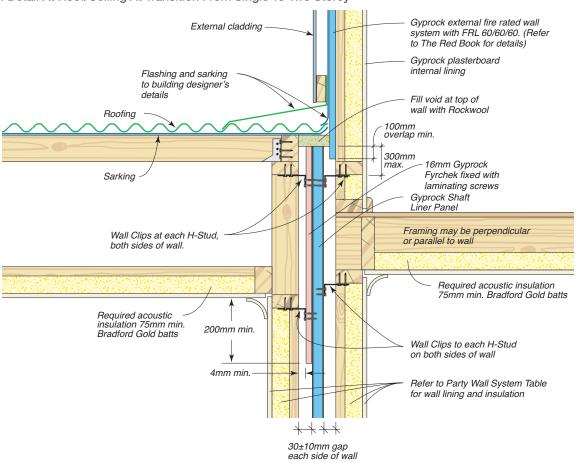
Detail At Roof/Ceiling At Transition From Single To Two Storey
